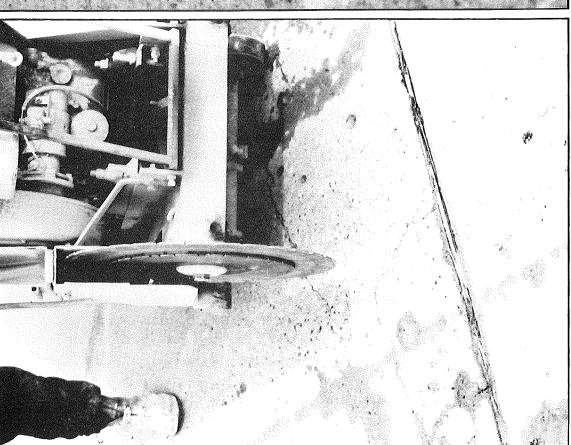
View of step saw cut after concrete removal. Cut made with blade arrangement shown in Figure 3.
